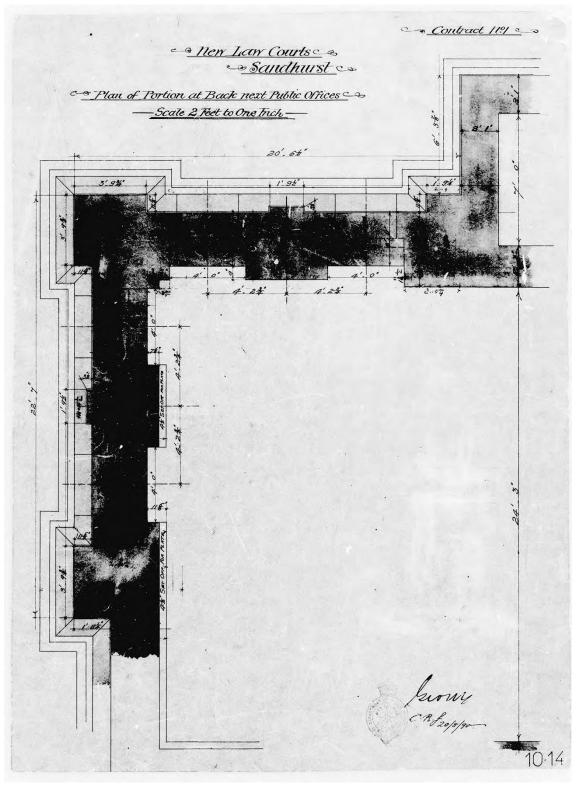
New Law Courts Sandhurst, Contract No. 1, Plan of Portion at Back next Public Offices Source: Public Works Department, PROV LCB 10.14
